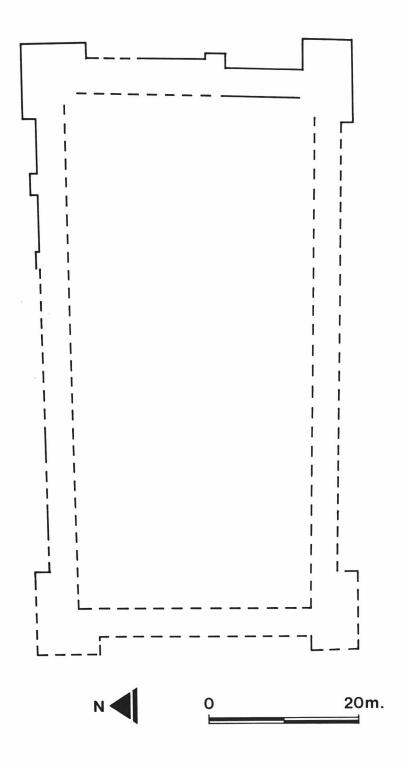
Plan of stage-post at Zulümtepe (schematic).
